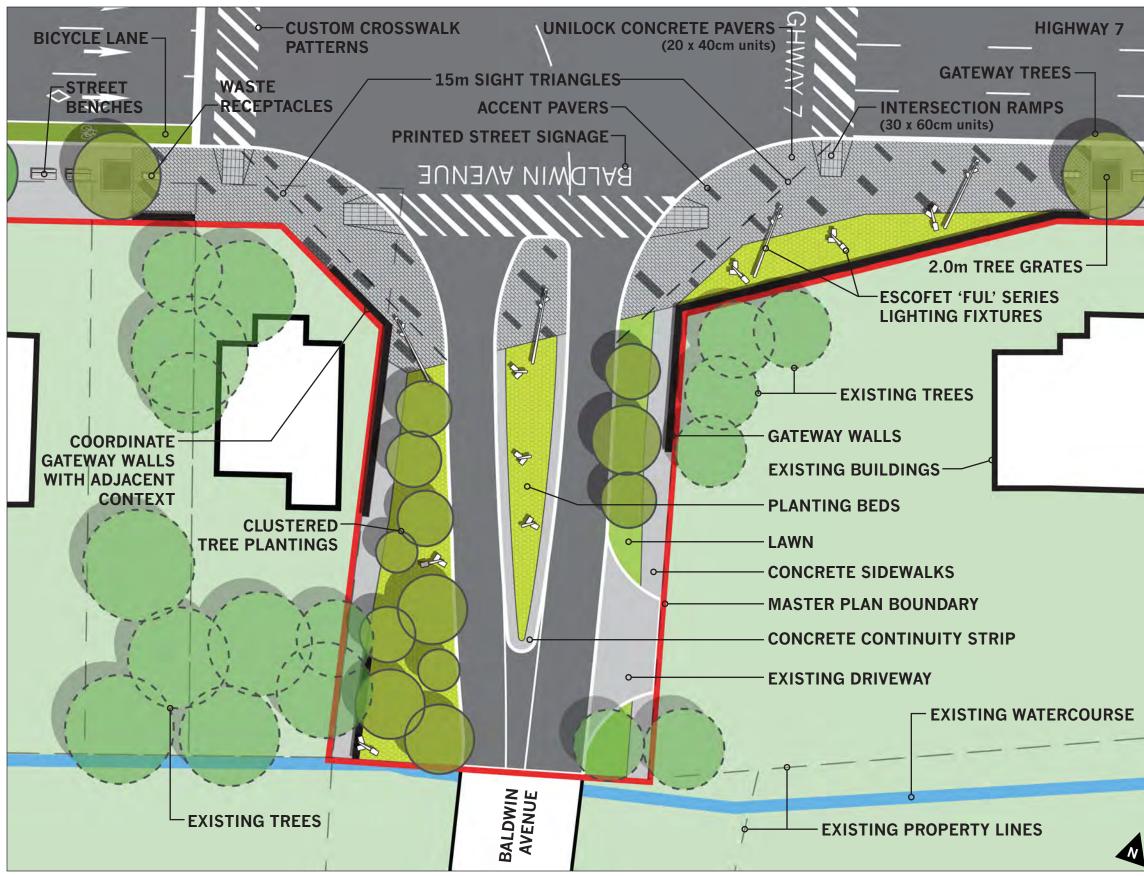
Baldwin Avenue Gateway streetscape concept (primary gateway).
